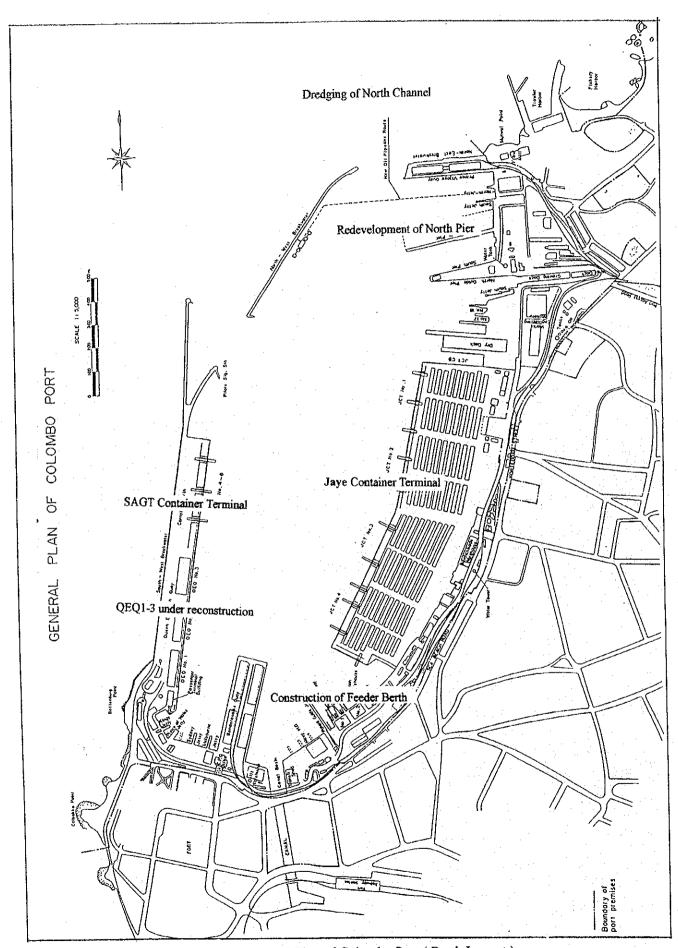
General Plan of Colombo Port (Berth Layout)
